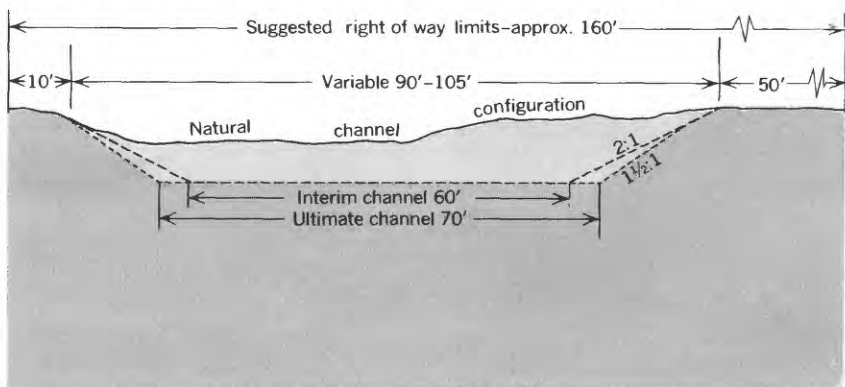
Typical channel cross section, 1958 Illinois Division of Waterways channel improvement plan for Salt Creek.
